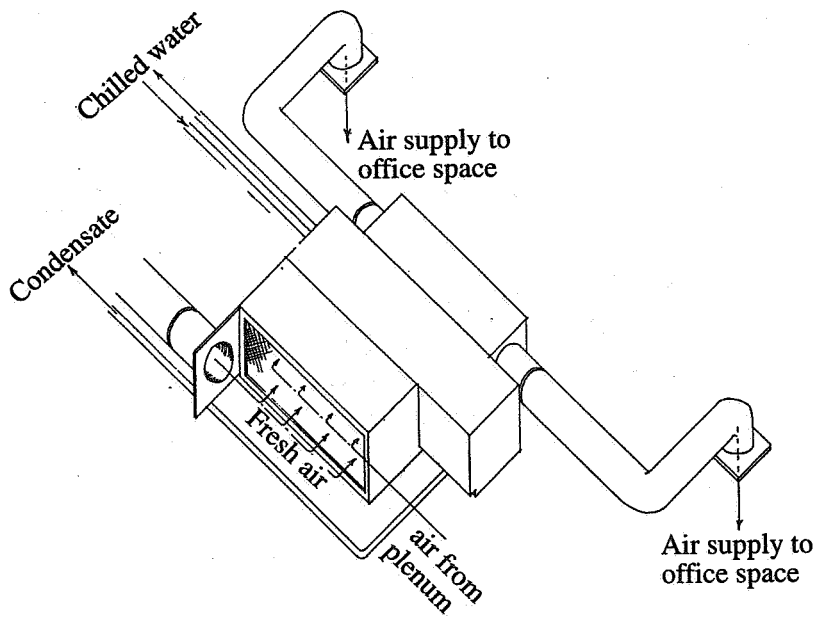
Direct ducting of fresh air to the face of the air handlers in building B.
